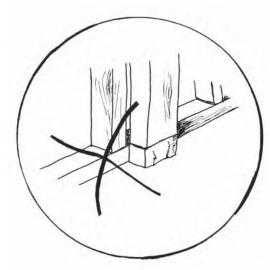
Incorrect installation of a short length of bottom wall plate beneath a door stud
